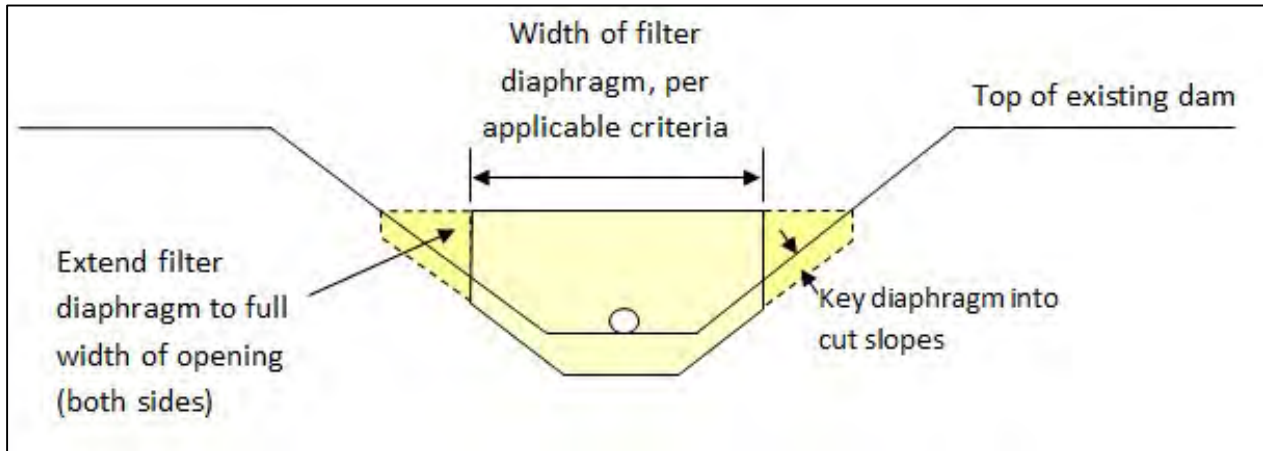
Recommended detail of a filter diaphragm extending across the entire width of an opening excavated through a dam (details of conduit cradle not shown).
